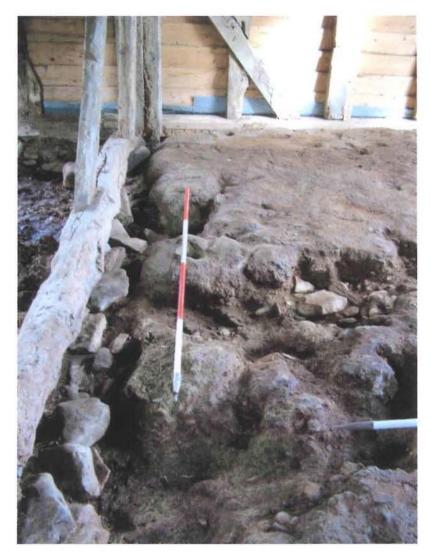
Cut (17) and sleeper wall (18) on the west side of Trench 1 (CPAT Photo 2345-005)
